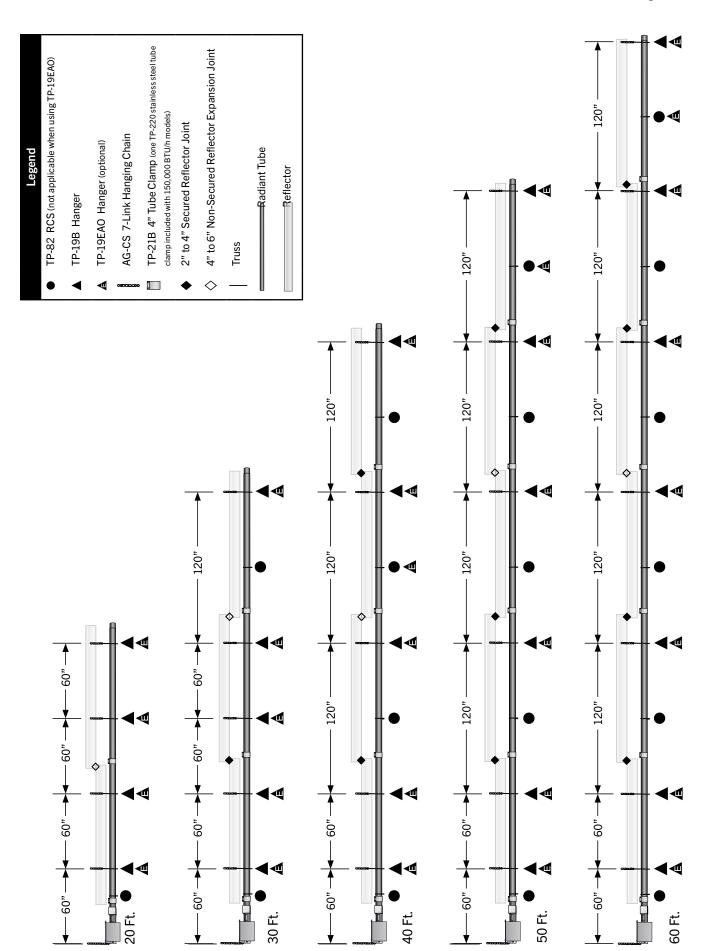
• Heater Suspension Layout • Five (5) Foot Truss Mounts
